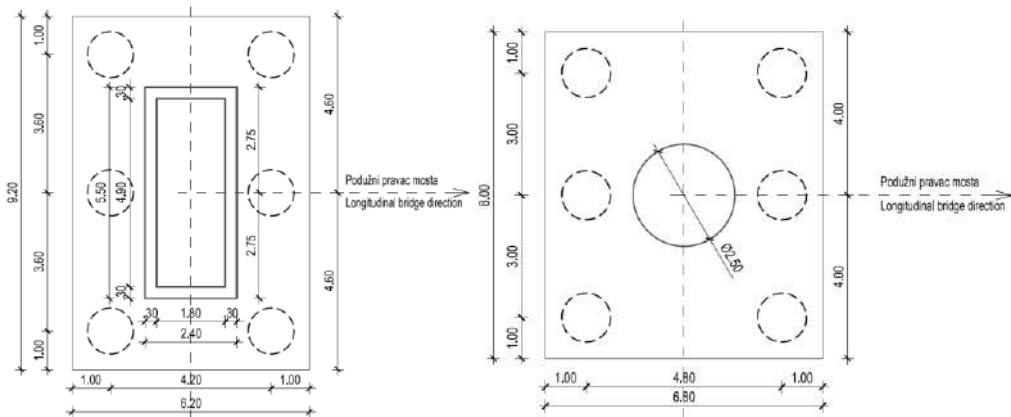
Typical hollow-box pier (left) and circular pier (right)
